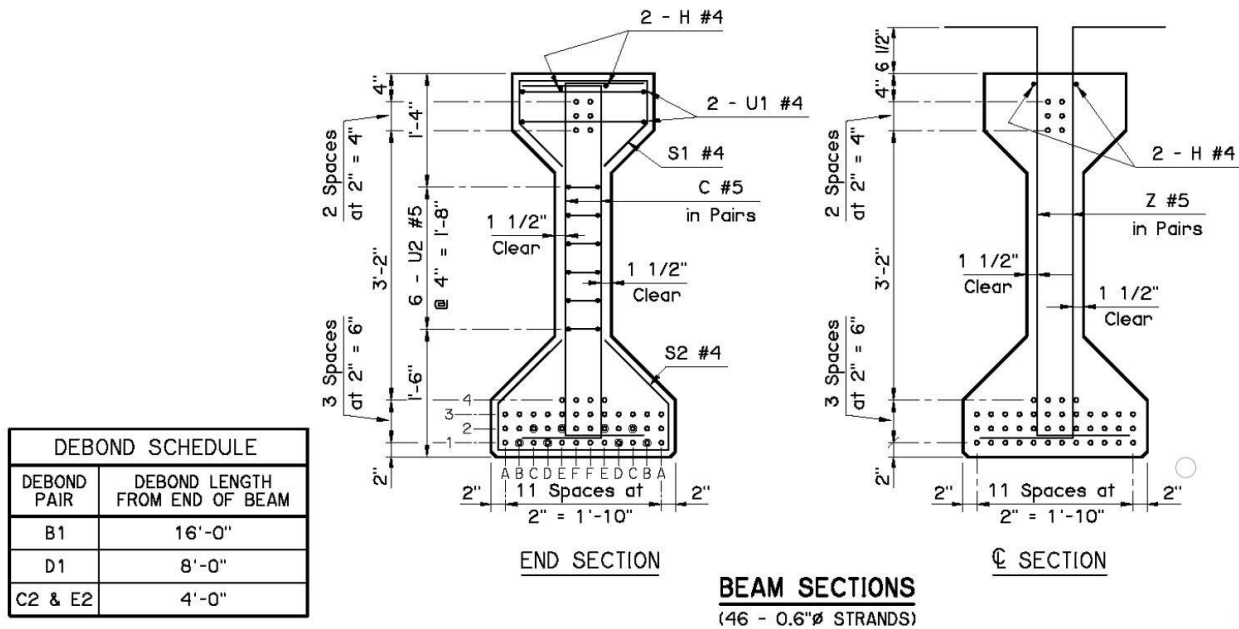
Type IV Prestressed Concrete Beam (100 ft. Span) Details by Oklahoma Department of Transportation (2009)
